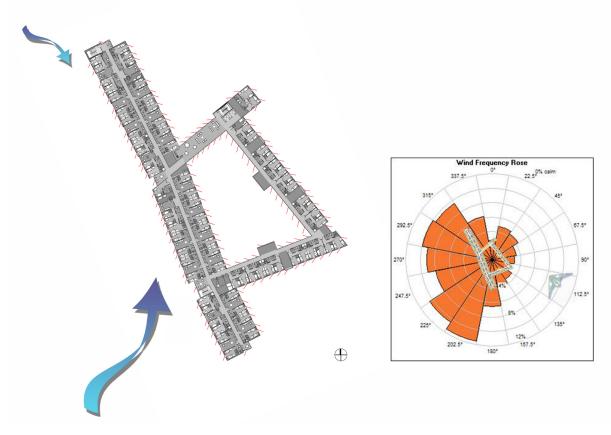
Natural Ventilation Diagram—Casement windows were oriented in the direction of the prevailing southwestern winds to "scoop" more air into the building.
